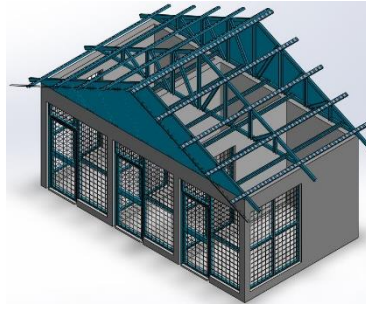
Section View of a Building before Implementing the Indirect Pumped System.
